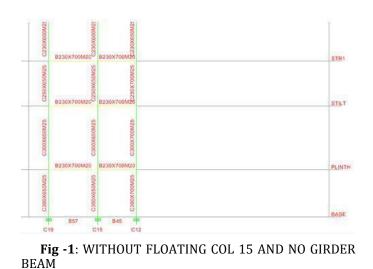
WITHOUT FLOATING COL 15 AND NO GIRDER BEAM
